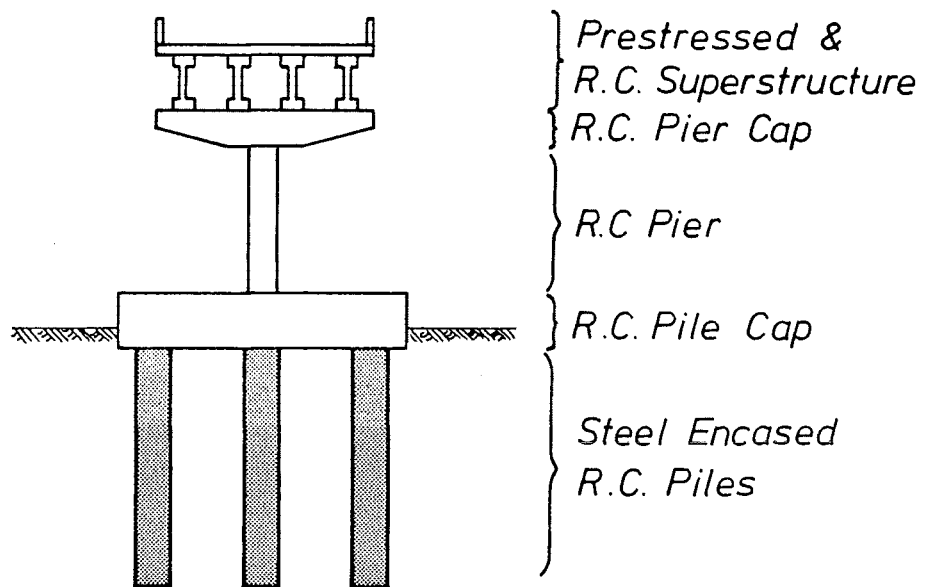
TYPICAL TWO-SPAN RAILWAY BRIDGE.
